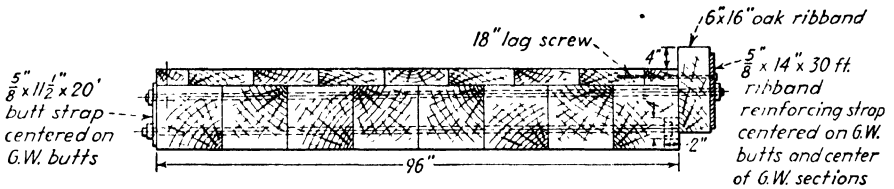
Transverse section of ground ways, showing reinforcing plate on ribband.
